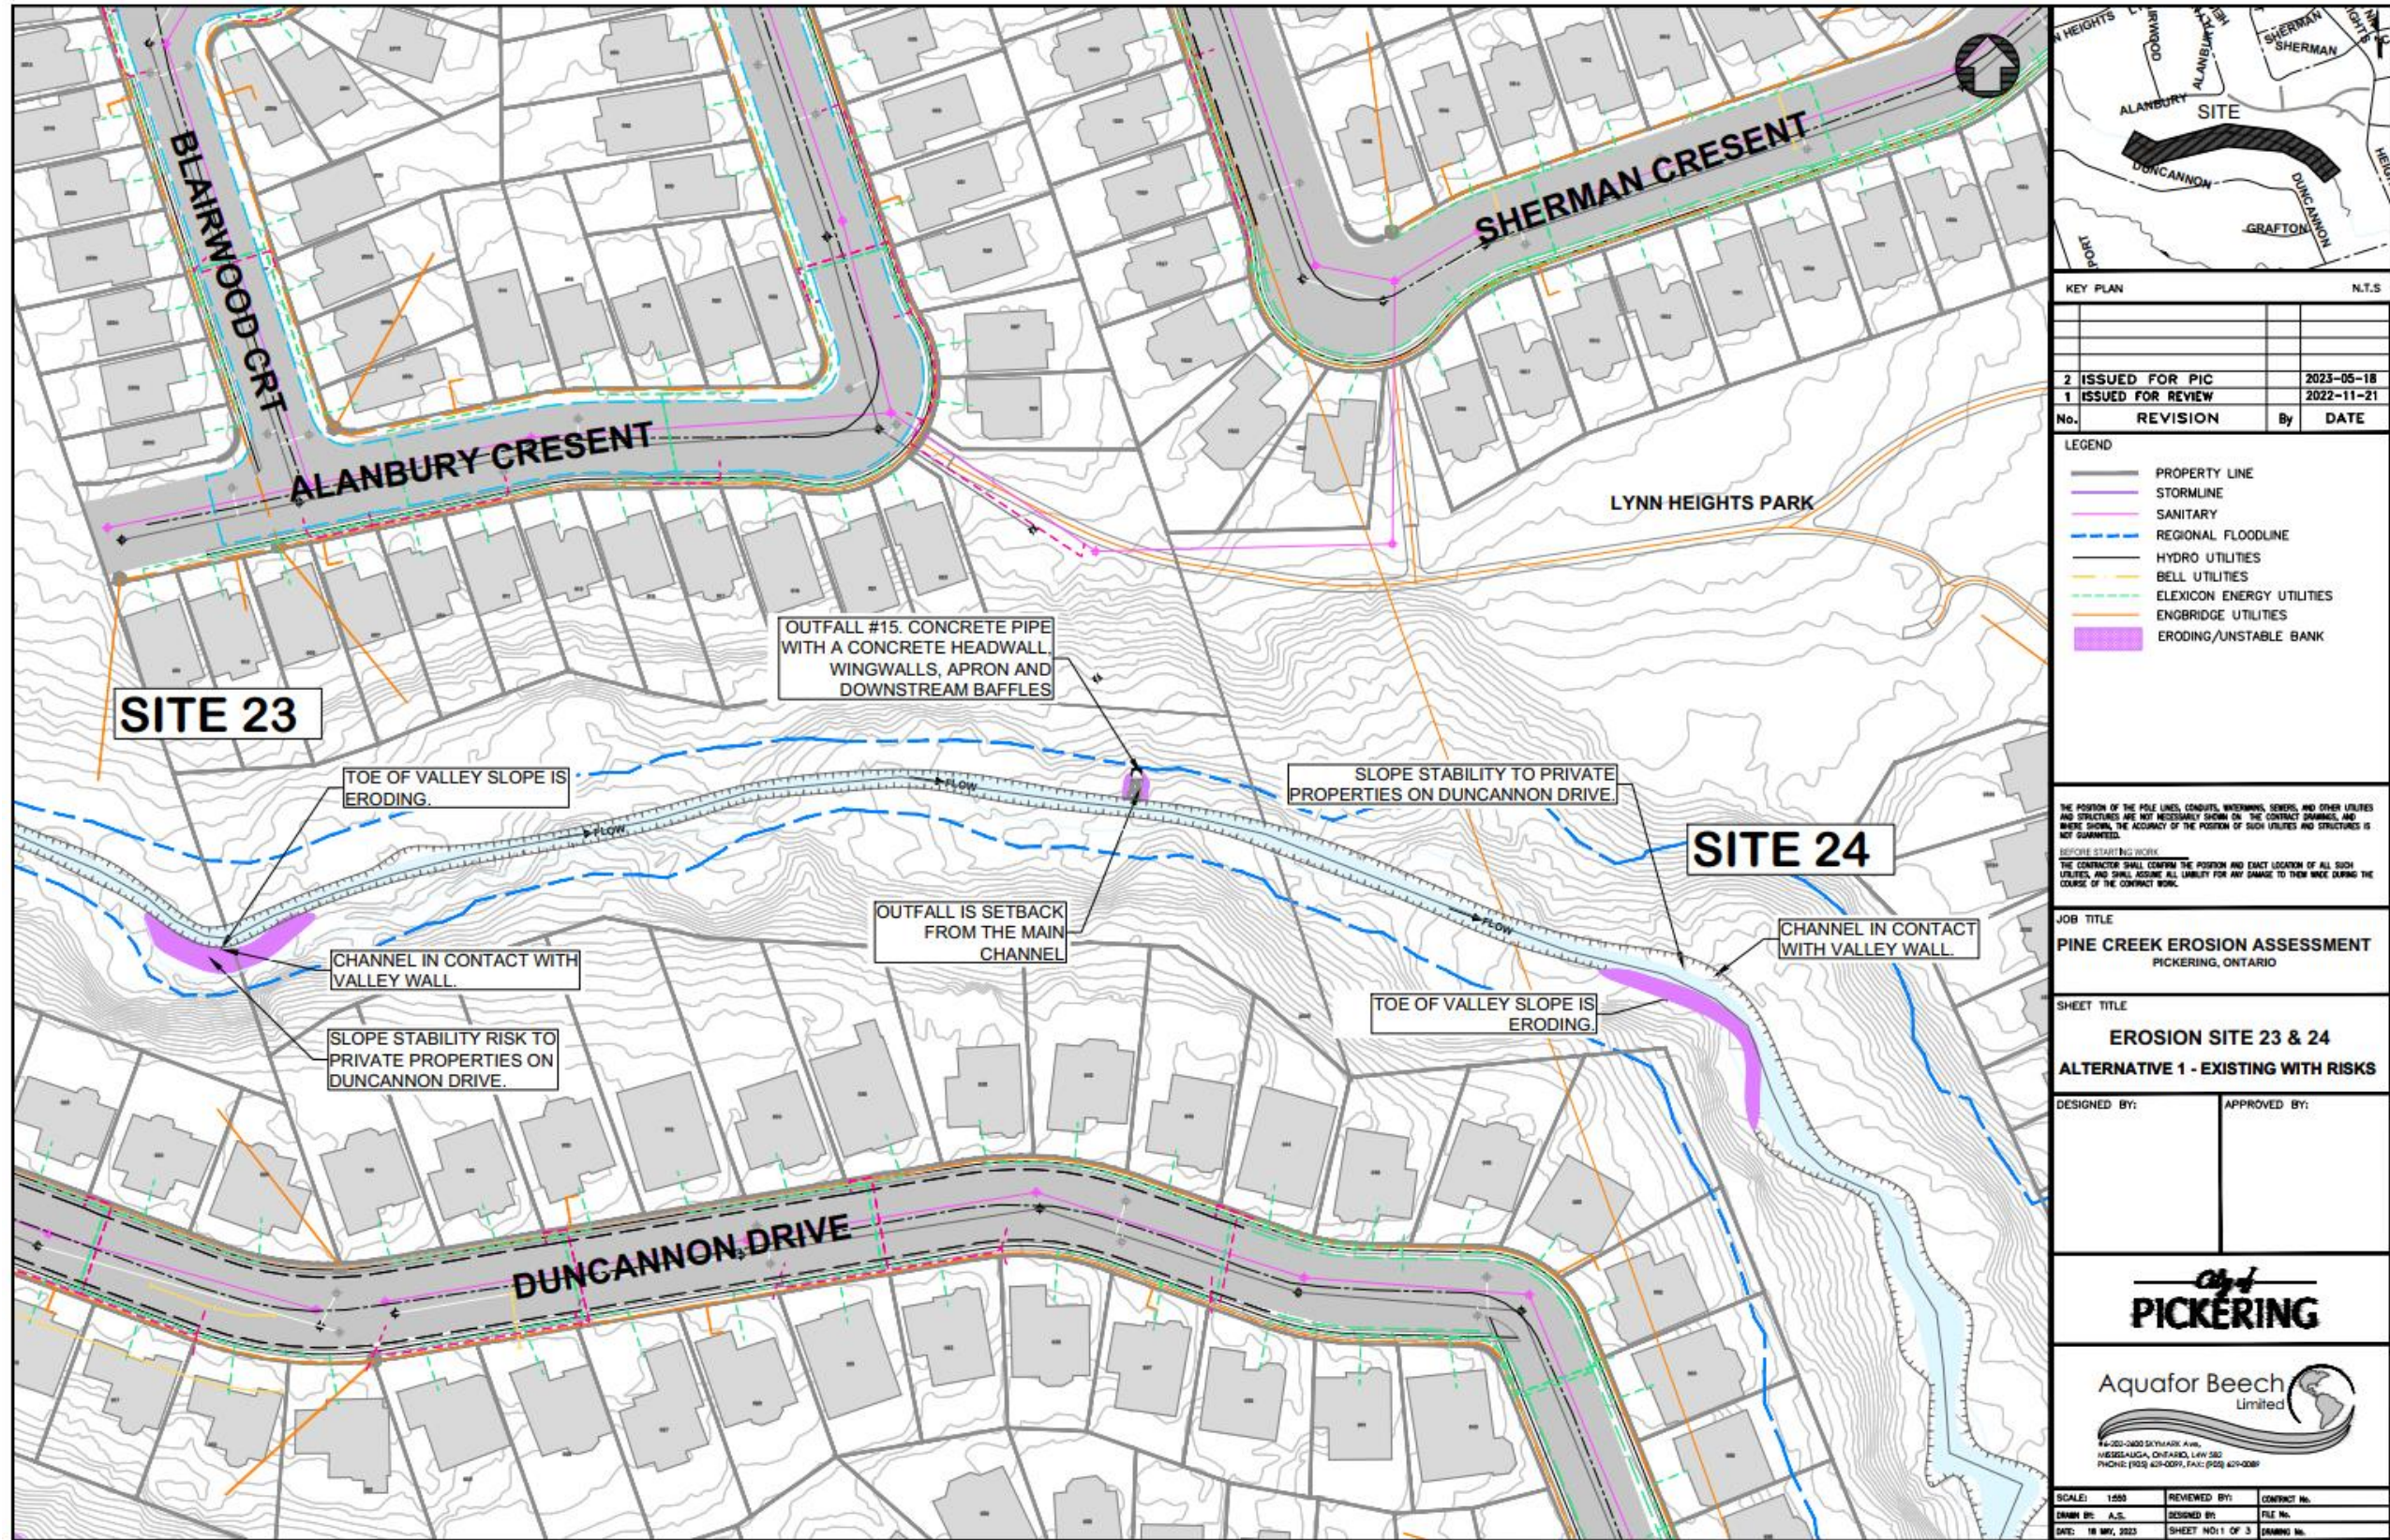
Erosion Site #23-24: Existing Site Conditions
